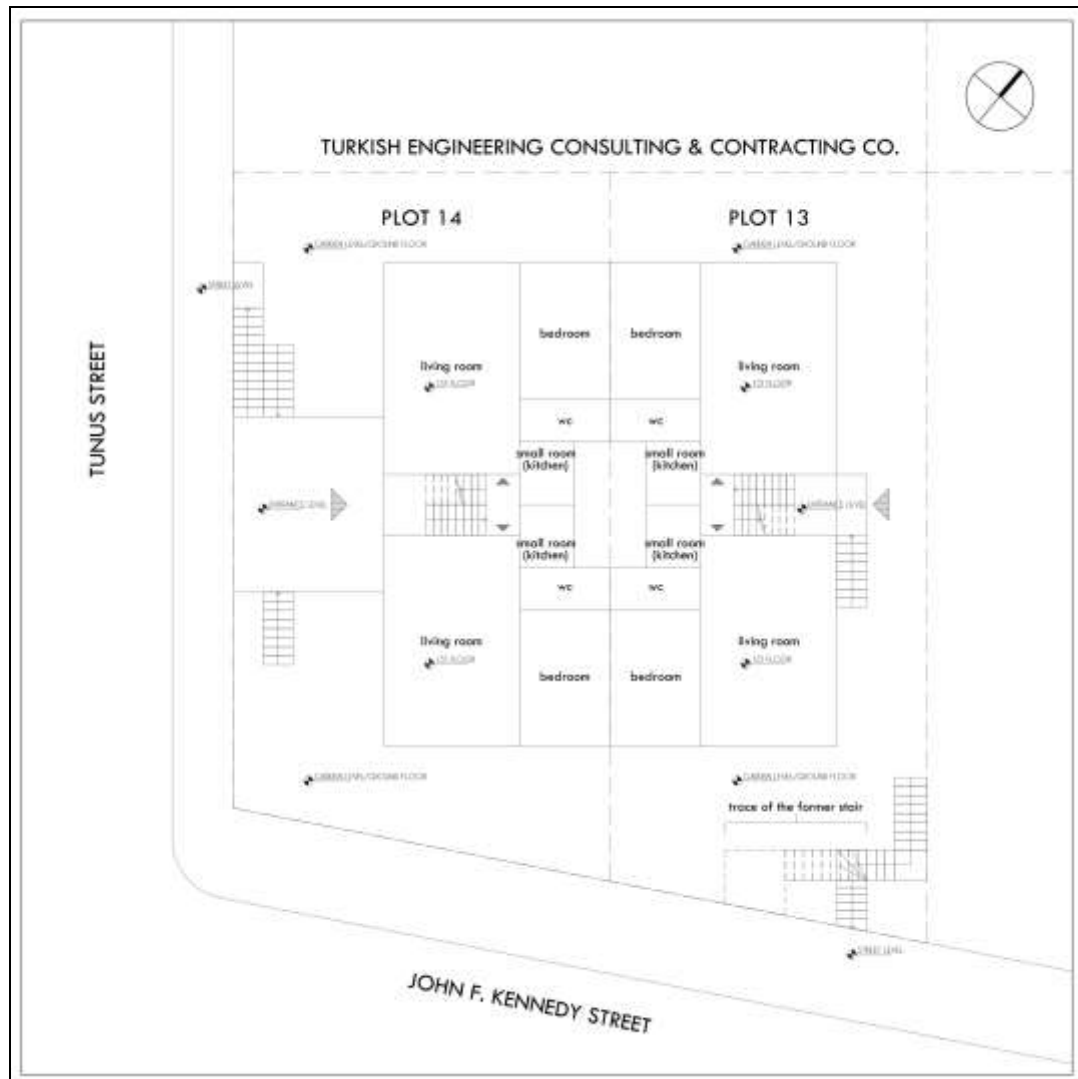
The Bina Former Approximate Plan Layout 1/250 (Source: Developed by the author)
